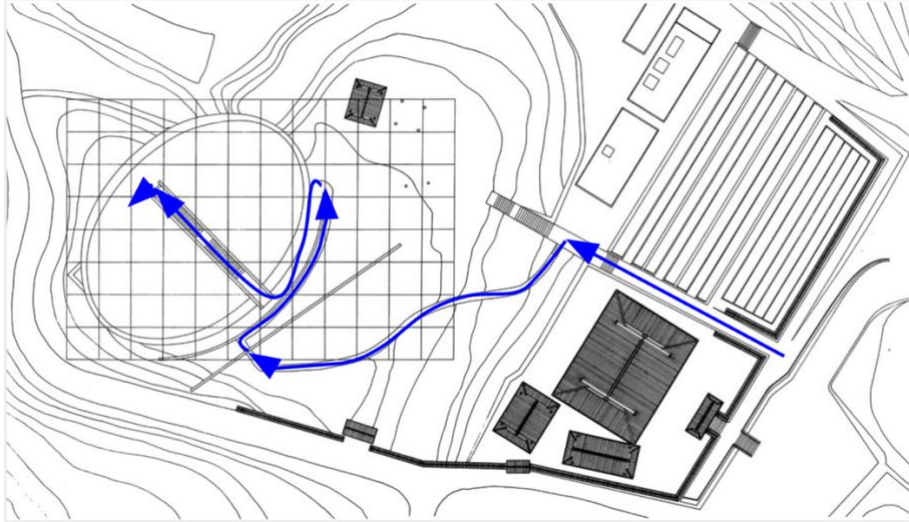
Staircase for underground chamber (Source: HIC Arquitectura)
